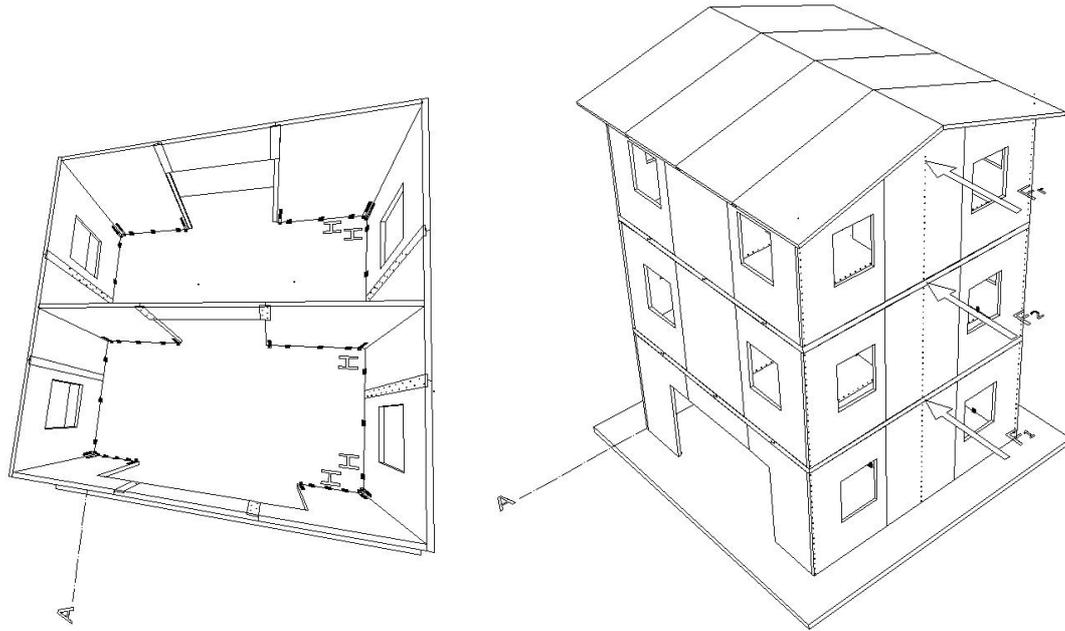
Distribution of holddown anchors and steel angles at ground floor and distribution of seismic forces at each floor. In the left side picture the holddown anchors marked with H are those taken into account in the design.
